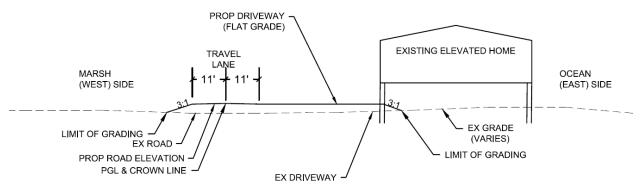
Typical driveway tie-in section "A": elevated house on east side of road.
